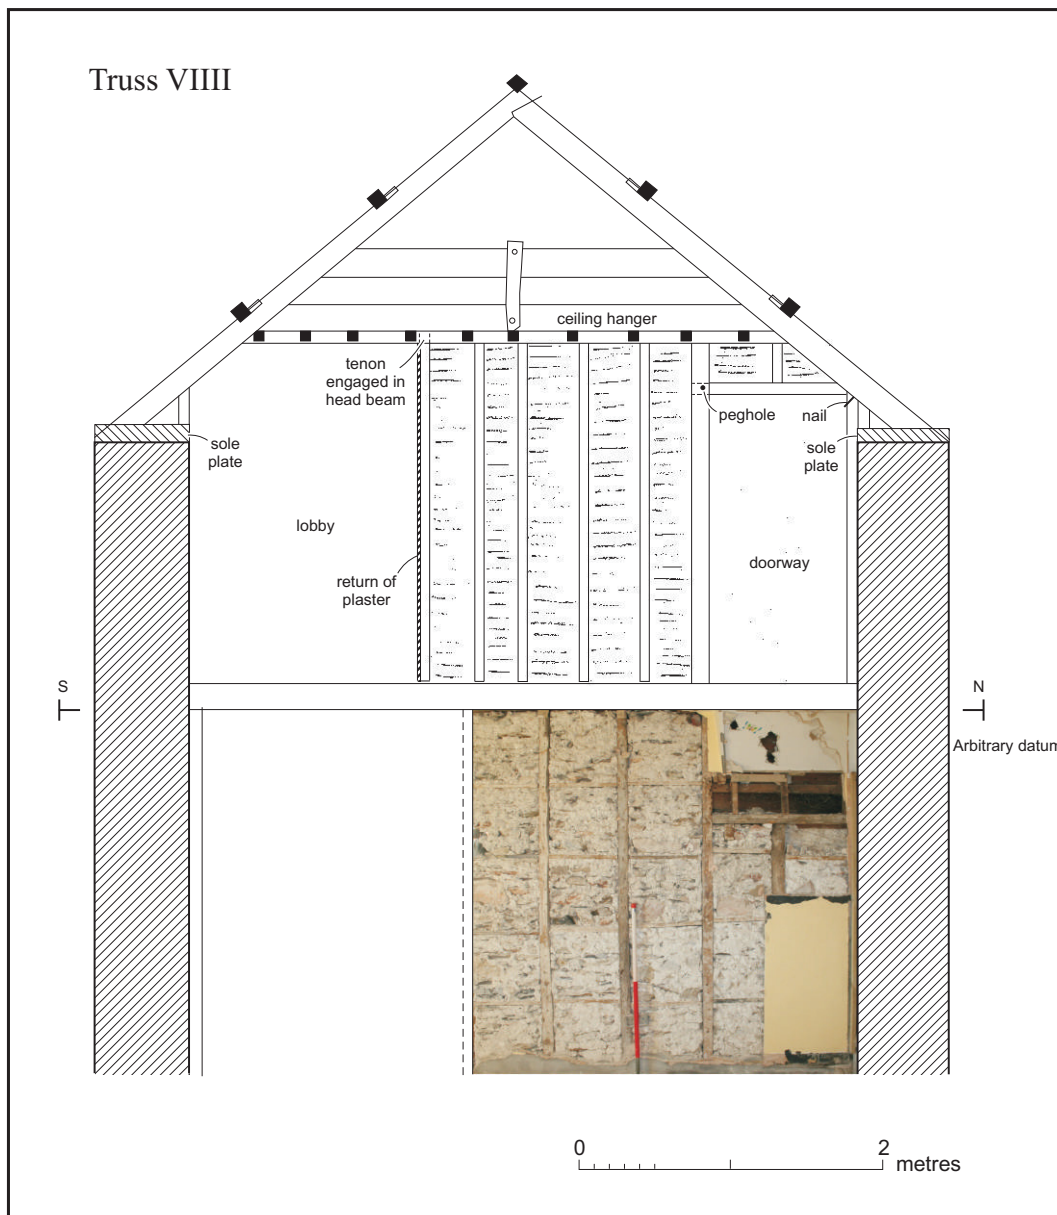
Section through S range at junction of parlour and stairs, with Truss VIII above.
